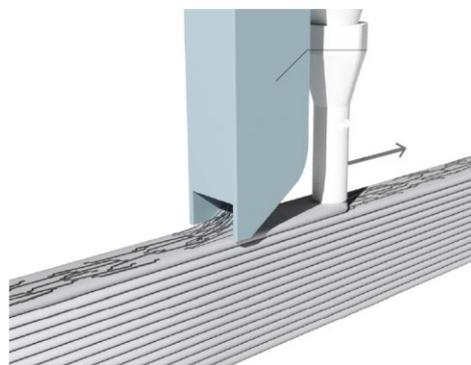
Reinforcement of the structure with fiberglass with separate laying of fiber and concrete
